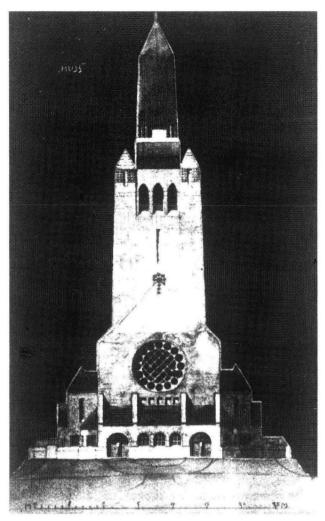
Sonck's entry for the competition of a new church in Helsinki, the Kallio church, 1906. First competition stage, pseudonym "Huss". Elevation towards the north. (Original and photo SRM).
